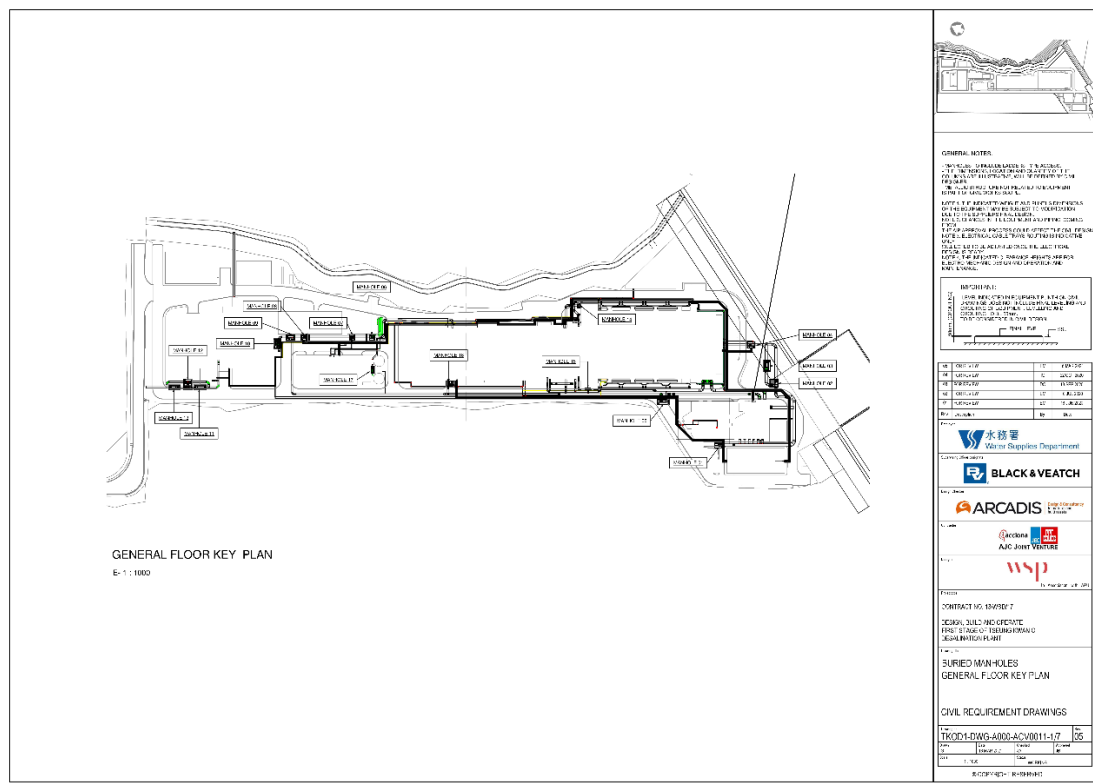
Landfill Gas Monitoring Location For Manholes/Pits
